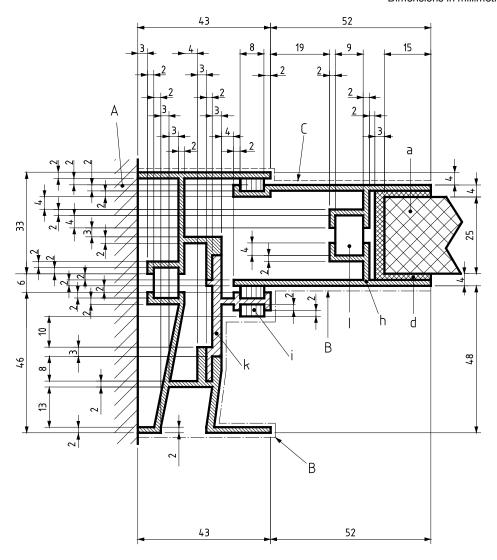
Sliding window frame section and insulation panel (b_{f} = 95 mm)
